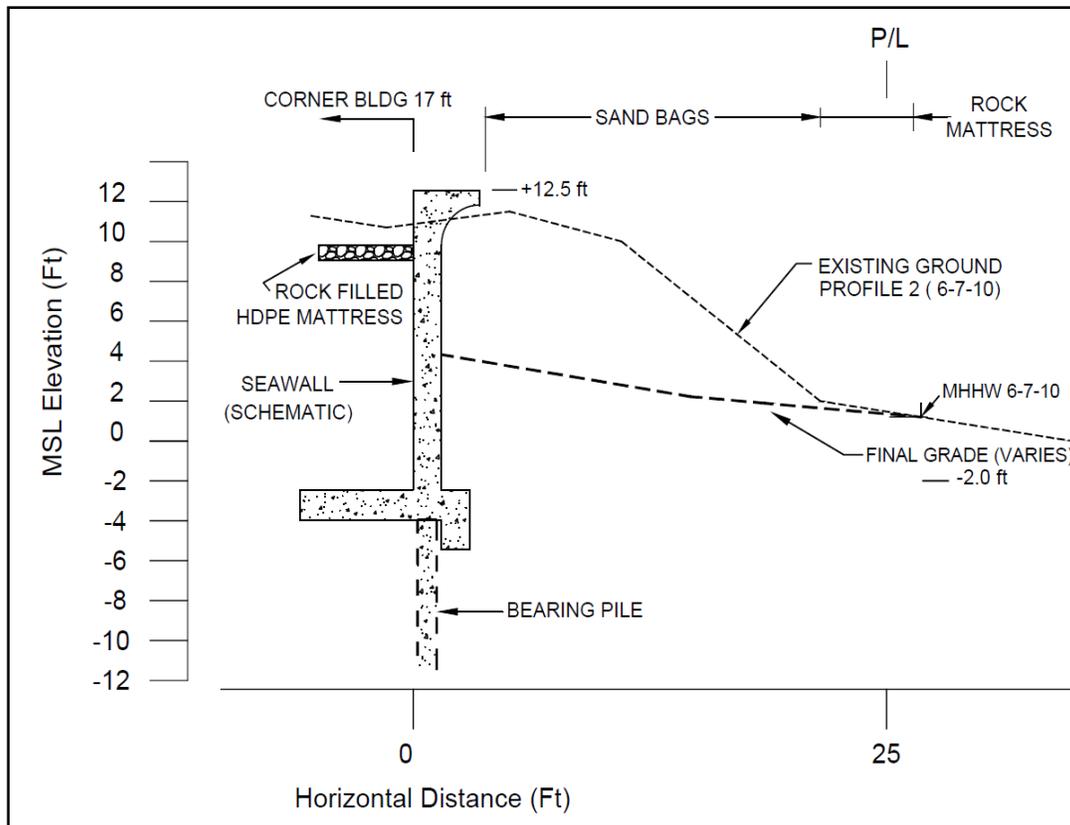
Cross-section for a typical seawall structure at the Hololani
